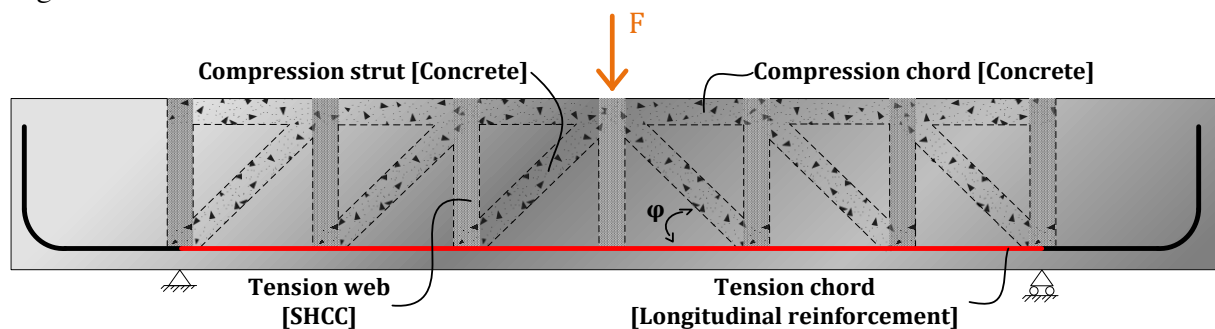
Example of a truss model in a hybrid beam without transverse reinforcement
